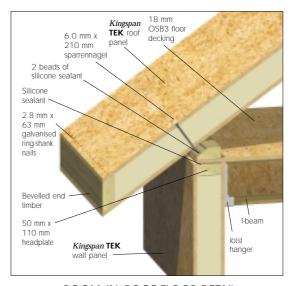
ROOM-IN-ROOF FLOOR DETAIL
